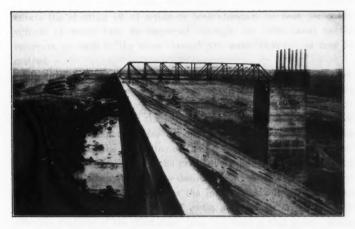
Side View of Outlet Works from the Reservoir, Showing Concrete Protection on Face of Embankment.
